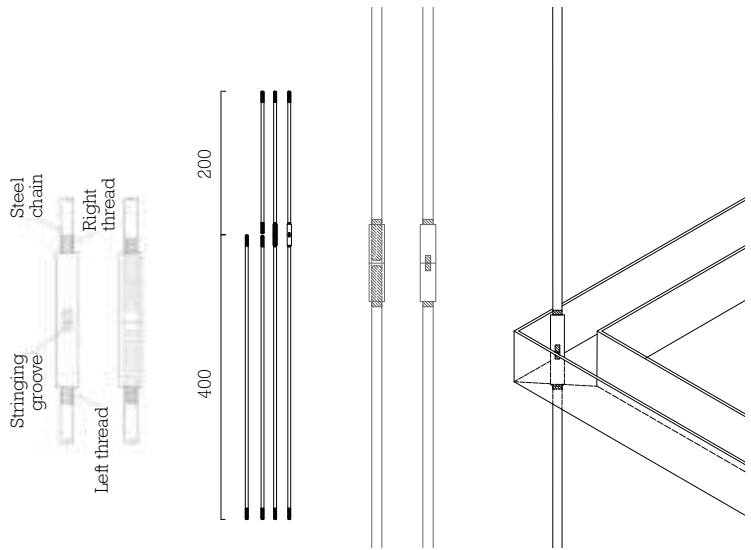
Construction detail - Tie rods of the structure | Axonometric view and dimensioned elevations.
